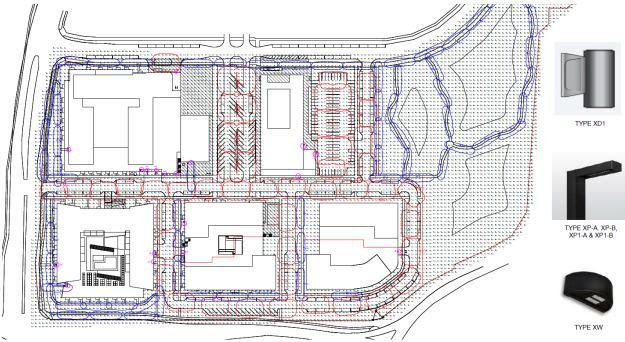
Submitted Overall Photometric Plan with Proposed Lighting.
